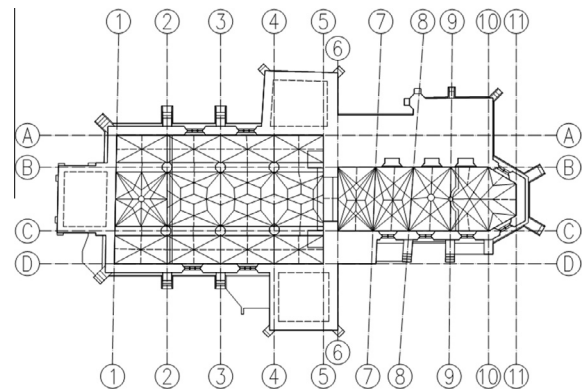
Horizontal layout of the church with arrangement of axes used for describing its structural elements.
